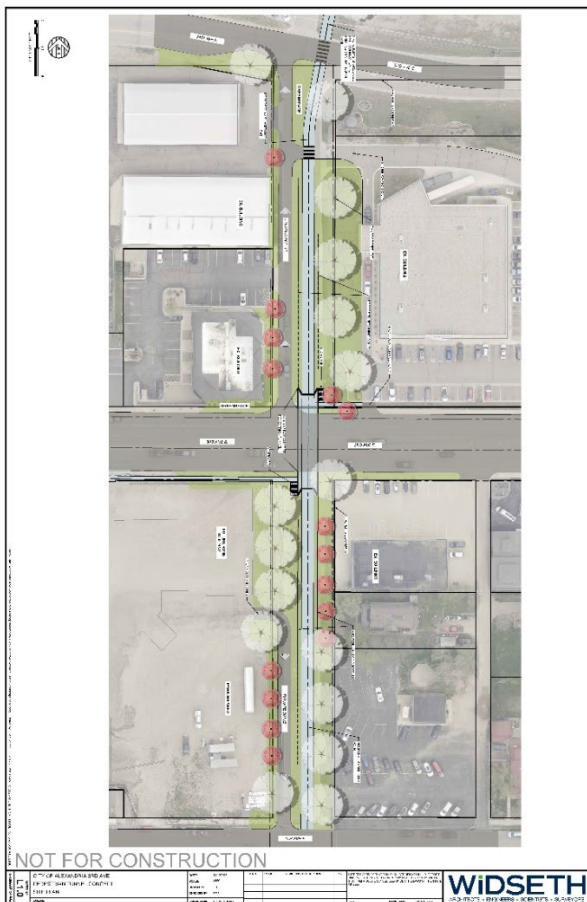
Preliminary Engineering Layout for an Underpass at Hawthorne Street
